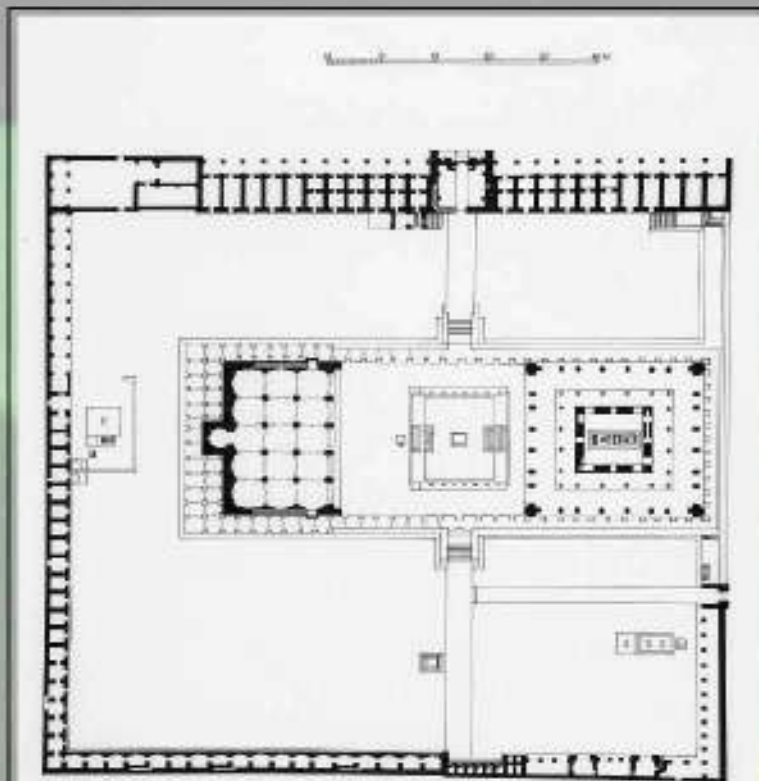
PLAN OF IBRAHIM ROUZA, BIJAPUR.
